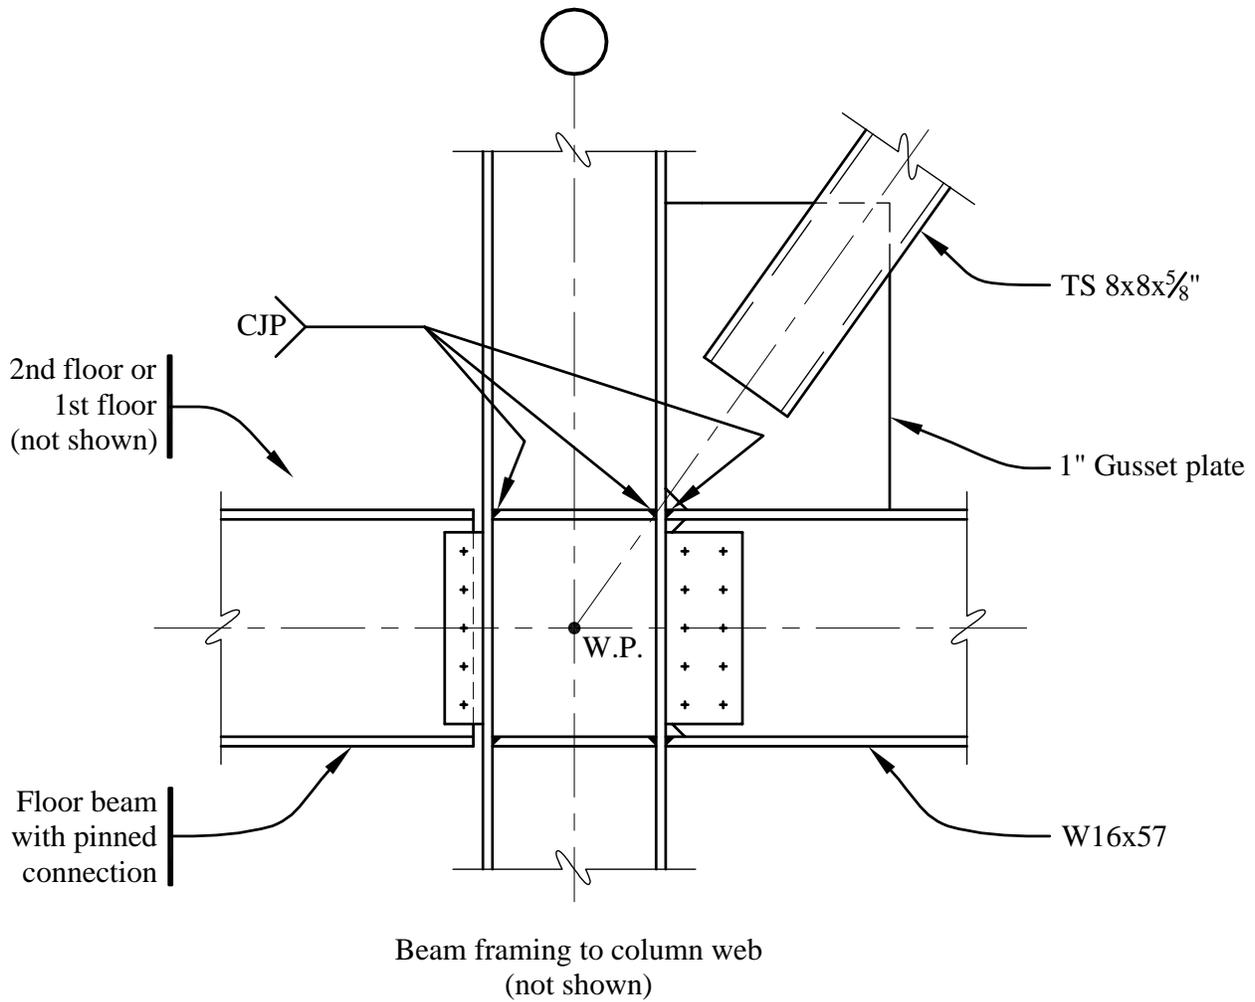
Lower brace connections (1.0 in. = 25.4 mm).
